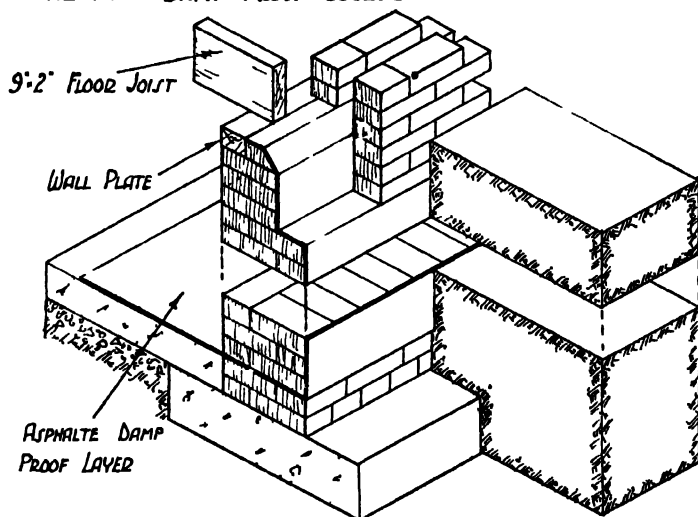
DAMP PROOF COURSE IN BASEMENT & CAVITY WALL
